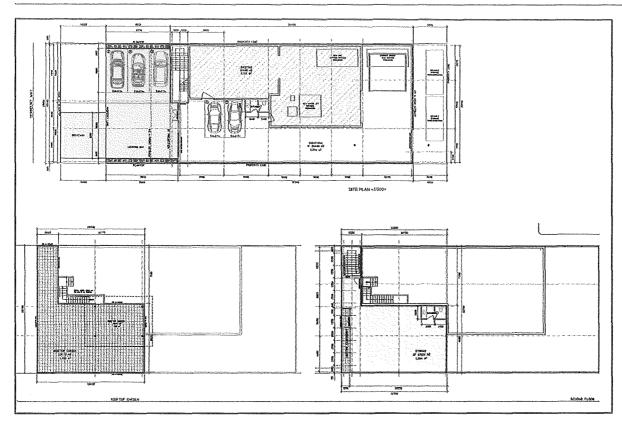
Proposed site plan (above), second floor (below-right) and roof top garden (below-left) images of the expanded light industral facility proposed for 1036 Seamount Way, Gibsons, BC. Source: Joe Oteruelo.
